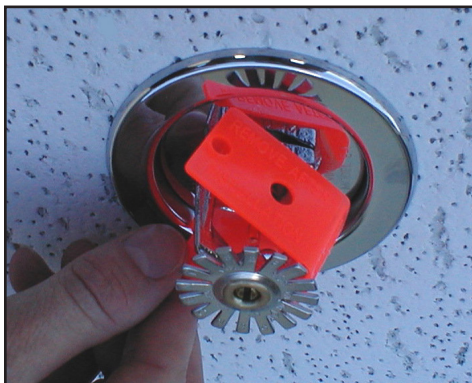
Sprinkler shield being removed from a pendent sprinkler.
